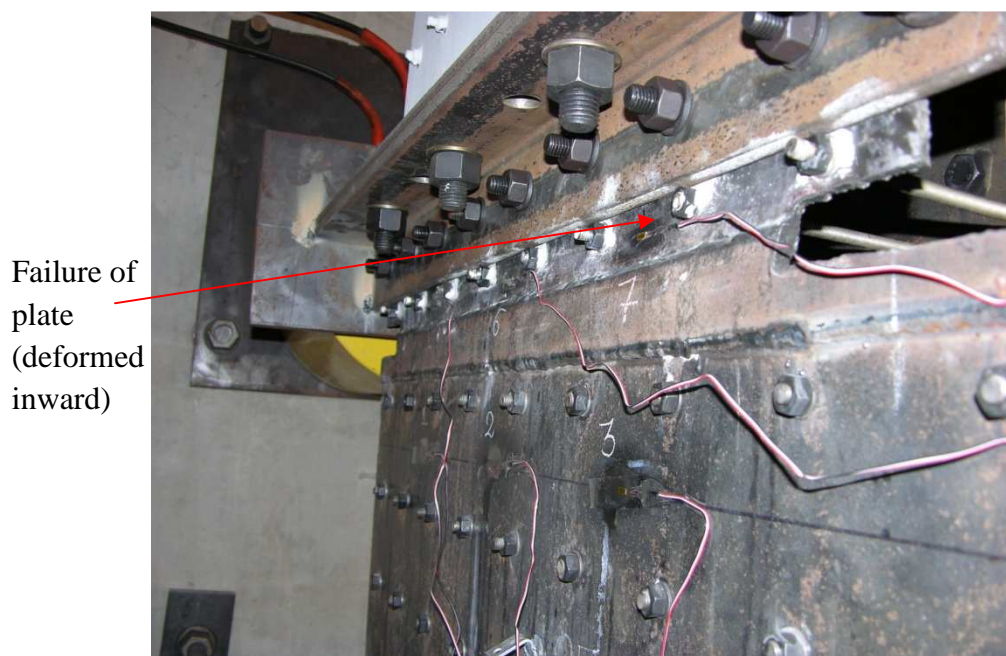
Failure of the Horizontal Connection - Test-2: View 2
